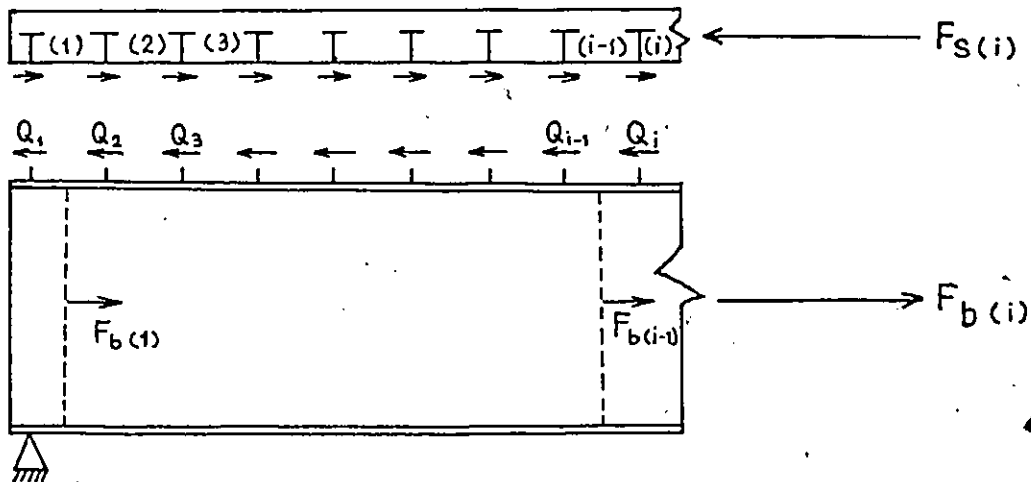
FREE BODY DIAGRAM OF THE SLAB AND THE STEEL BEAM WITH HORIZONTAL FORCES ONLY
